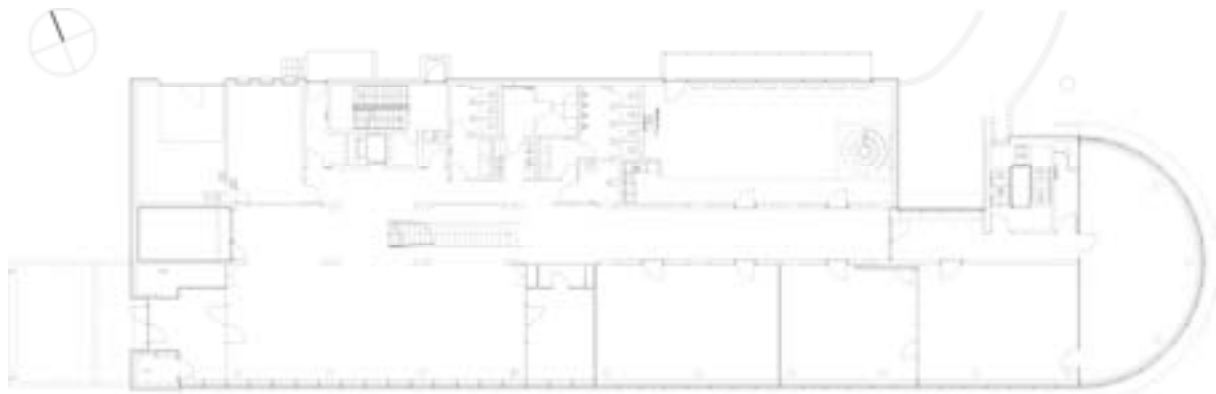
Floor plan ground floor VGH Lüneburg [source: Architekten LMS, Hannover]
